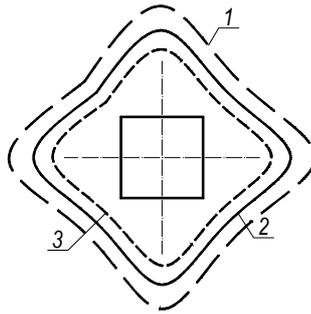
Compaction ground zones (1, 2, 3) around square cross-section pile determined by the corresponding formulas
